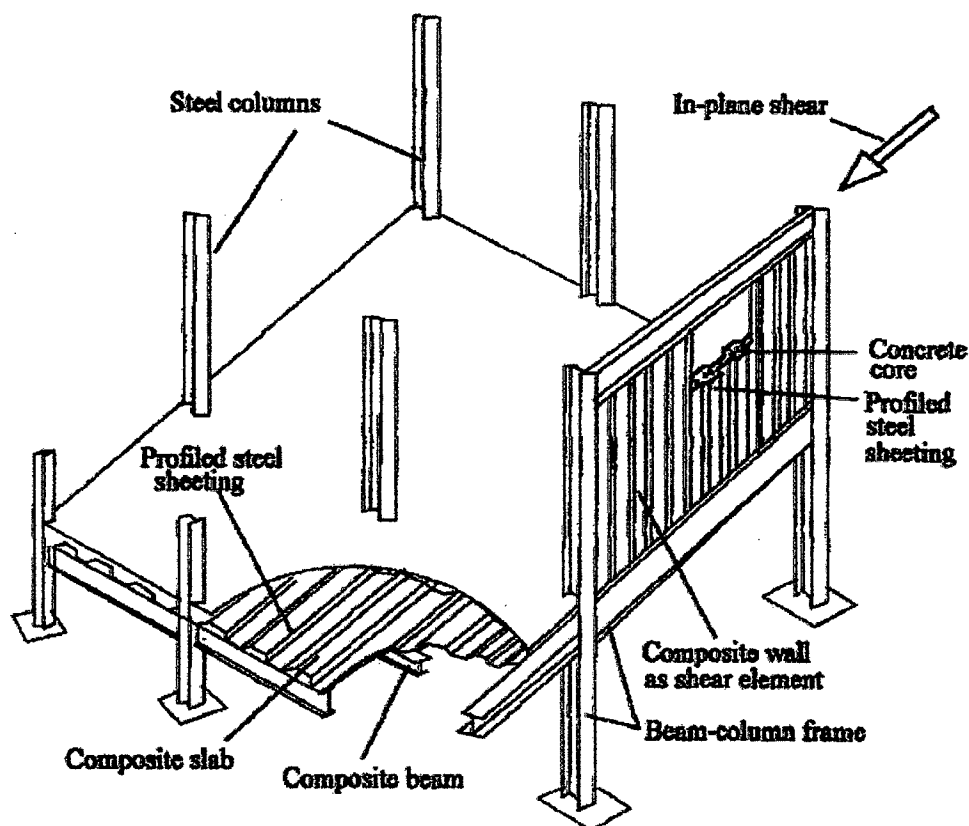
Application of Profiled Steel Sheeting in a Building Frame
